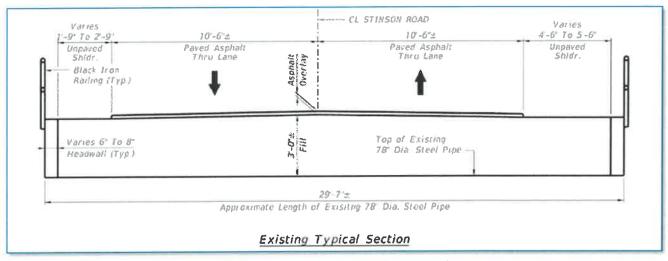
Stinson Rd Typical Section at Muddy Creek
